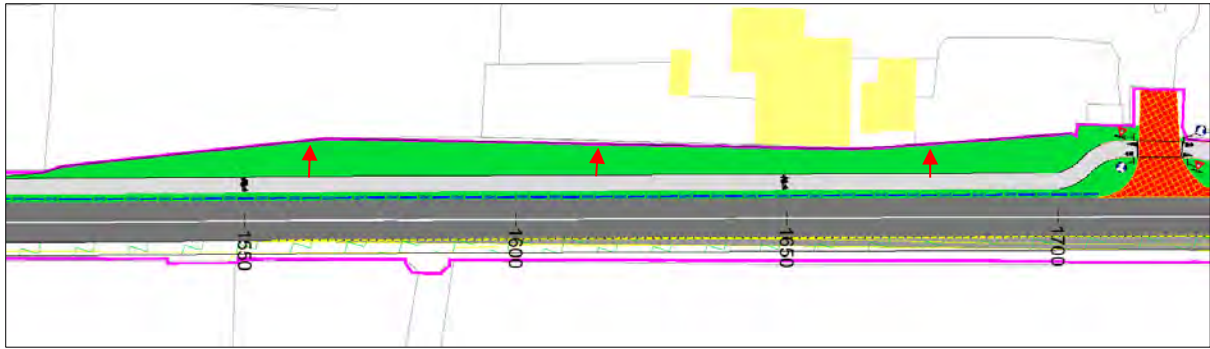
Proposed Layout (Drawing 11199-08-1012)
